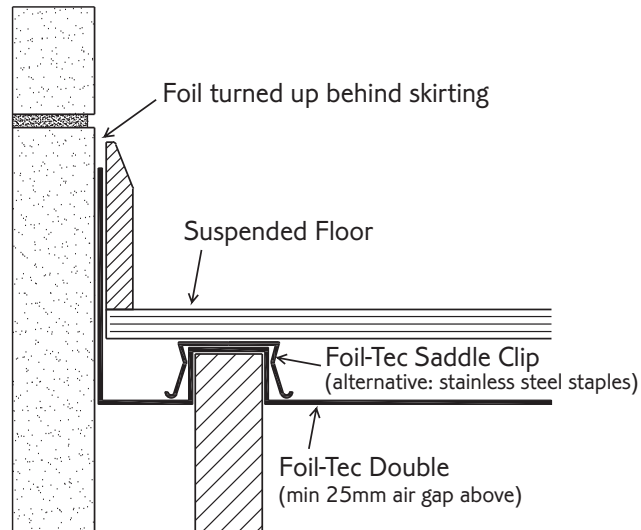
Suspended timber floor buildup with Foil-Tec Double
